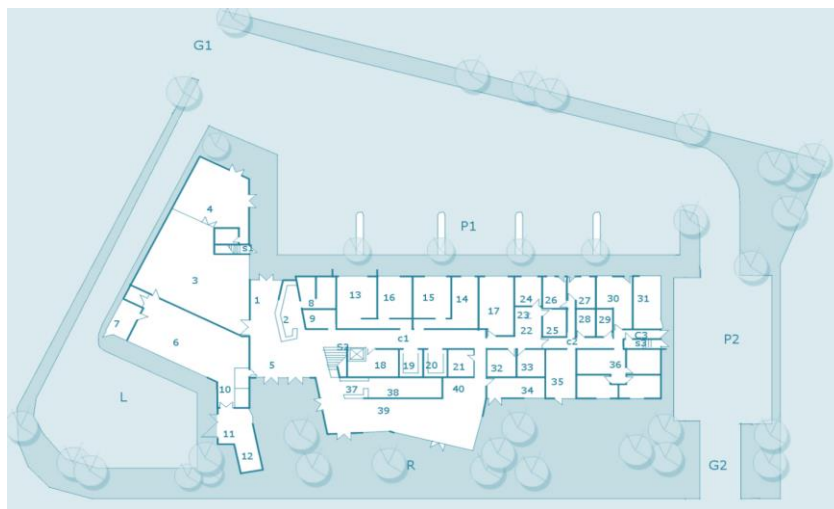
Site plan and ground floor plan of homeless shelter, redrawn based on images retrieved from archdaily.com.
